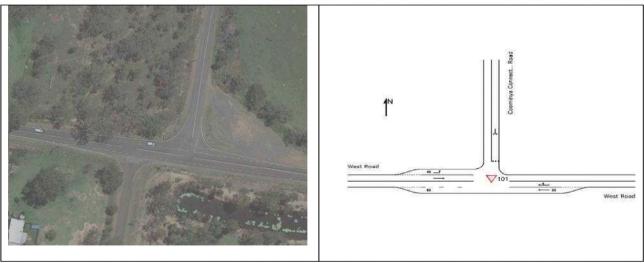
Aerial Photo and SIDRA Layout - Coominya Connection Road / West Road
